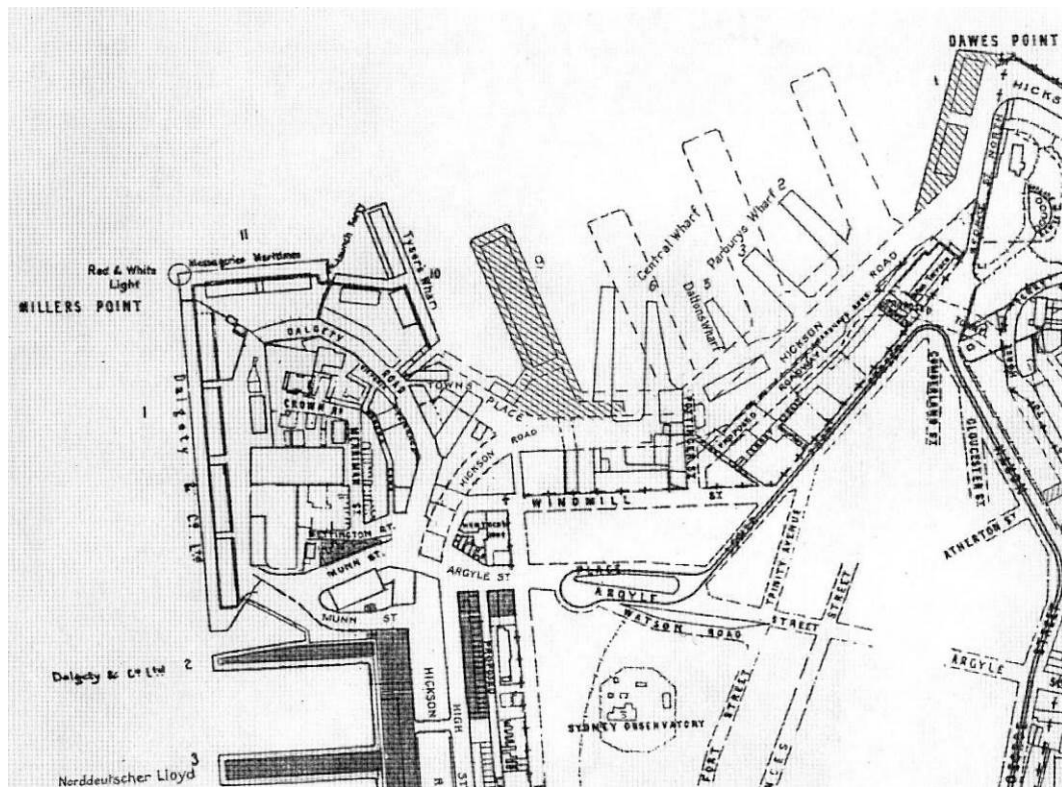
1911 plan of Walsh Bay wharves.<sup>37</sup>
